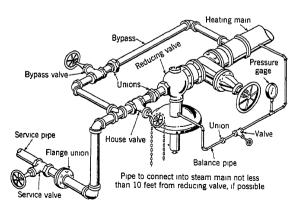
Connections for Reducing Valves of Size 4 In. and Larger, and for Expanded Valves
